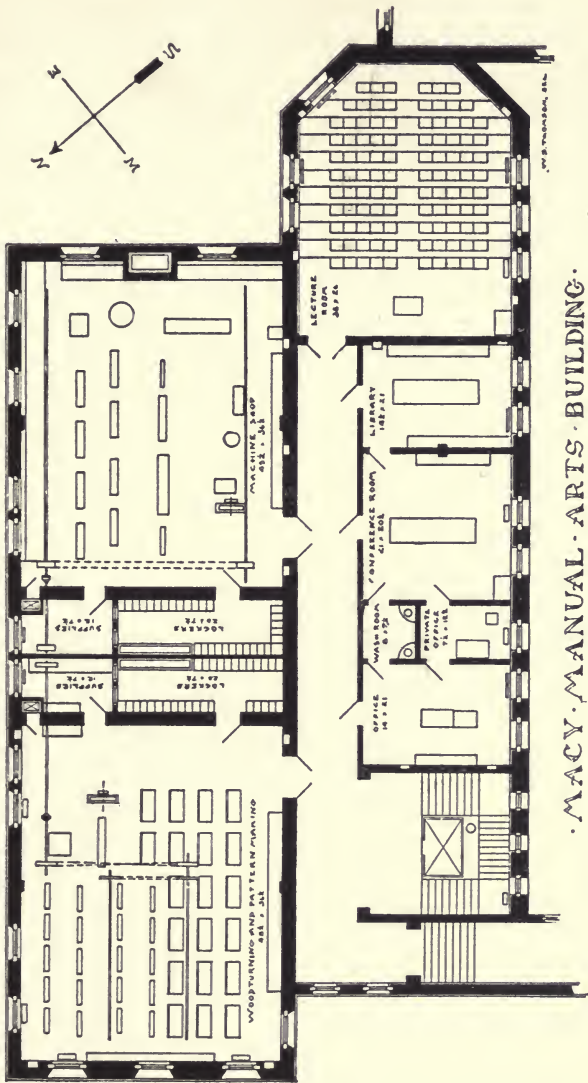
FIRST-FLOOR PLAN, MACY MANUAL ARTS BUILDING
